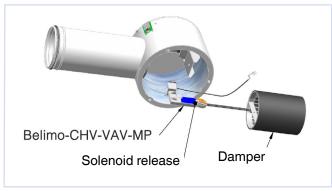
, In order to disconnect the pitch rack from the actuator, you have to place a magnet in the specified position on the actuator. You will find the magnet on the bracket between the damper and the rail.(MI)
